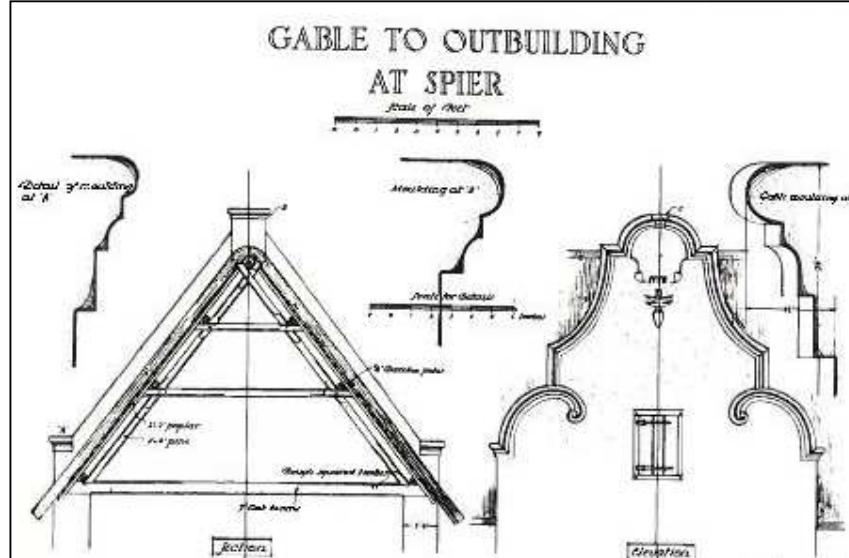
Details of a gable and timber roof structure of Spier outbuilding (Pearse, 1968: 19).
